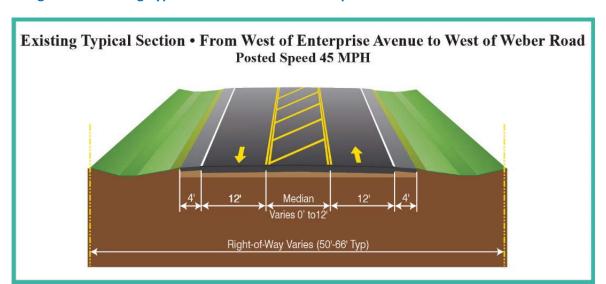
Existing Typical Section – West of Enterprise Avenue to West of Weber Road
